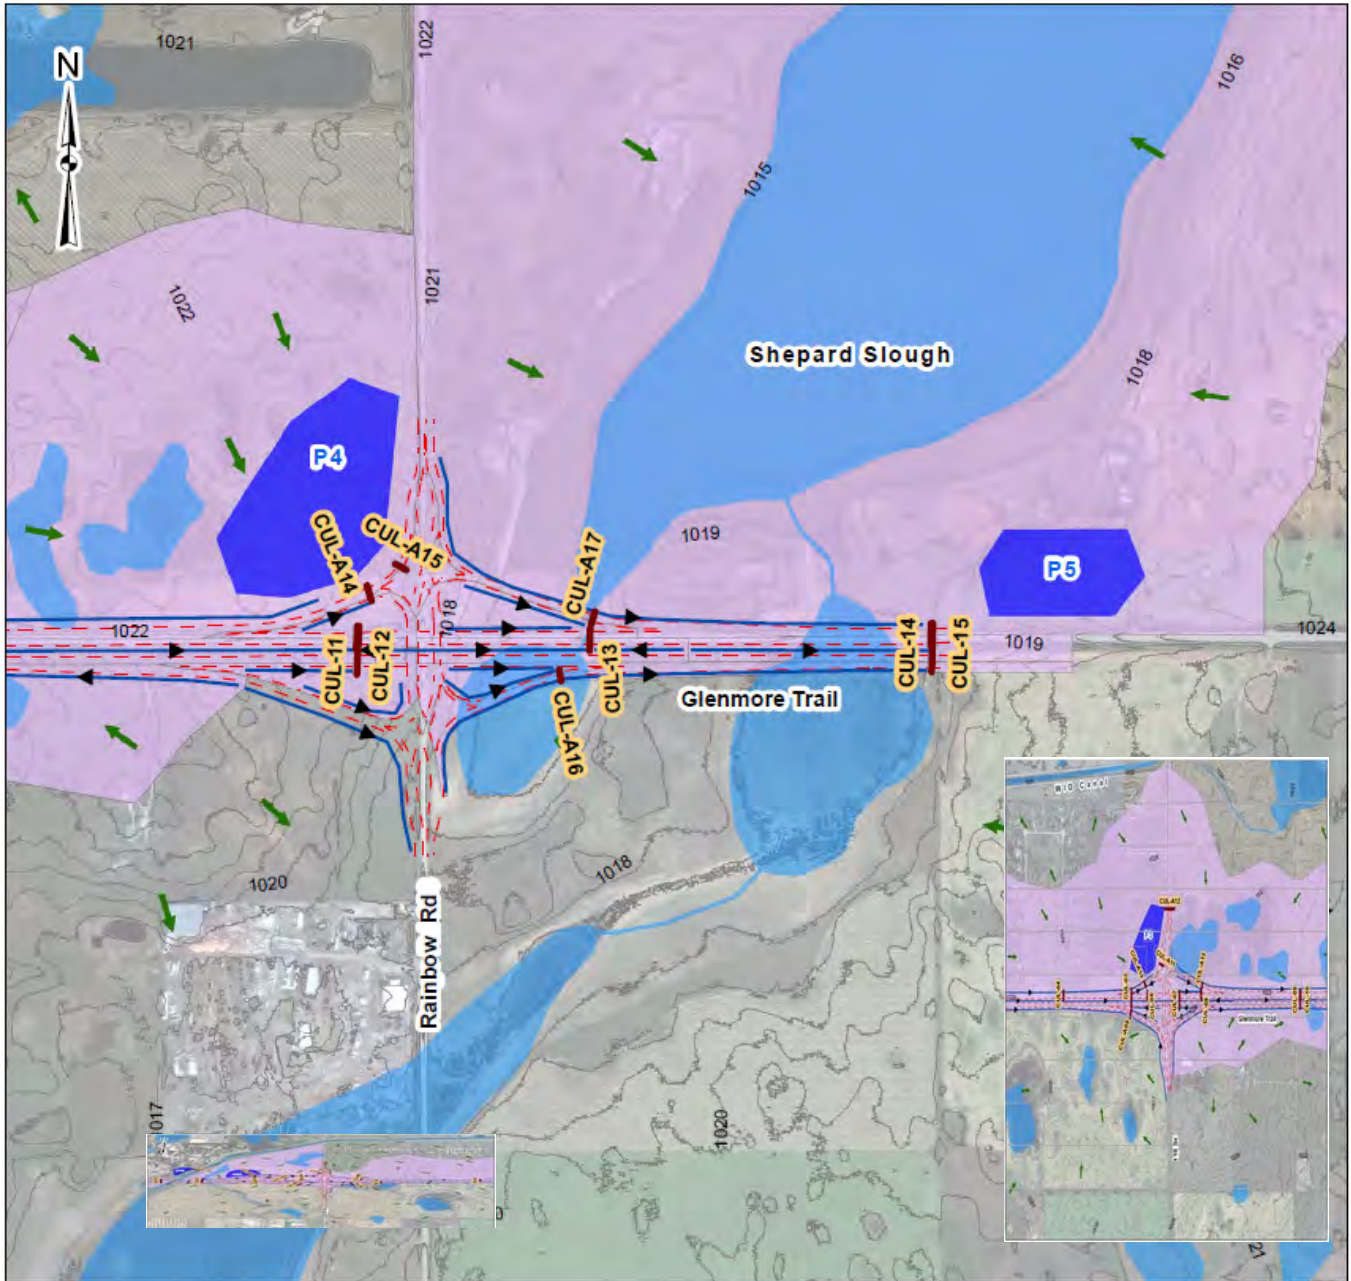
RAINBOW ROAD INTERCHANGE STORMWATER AND DRAINAGE PLAN
